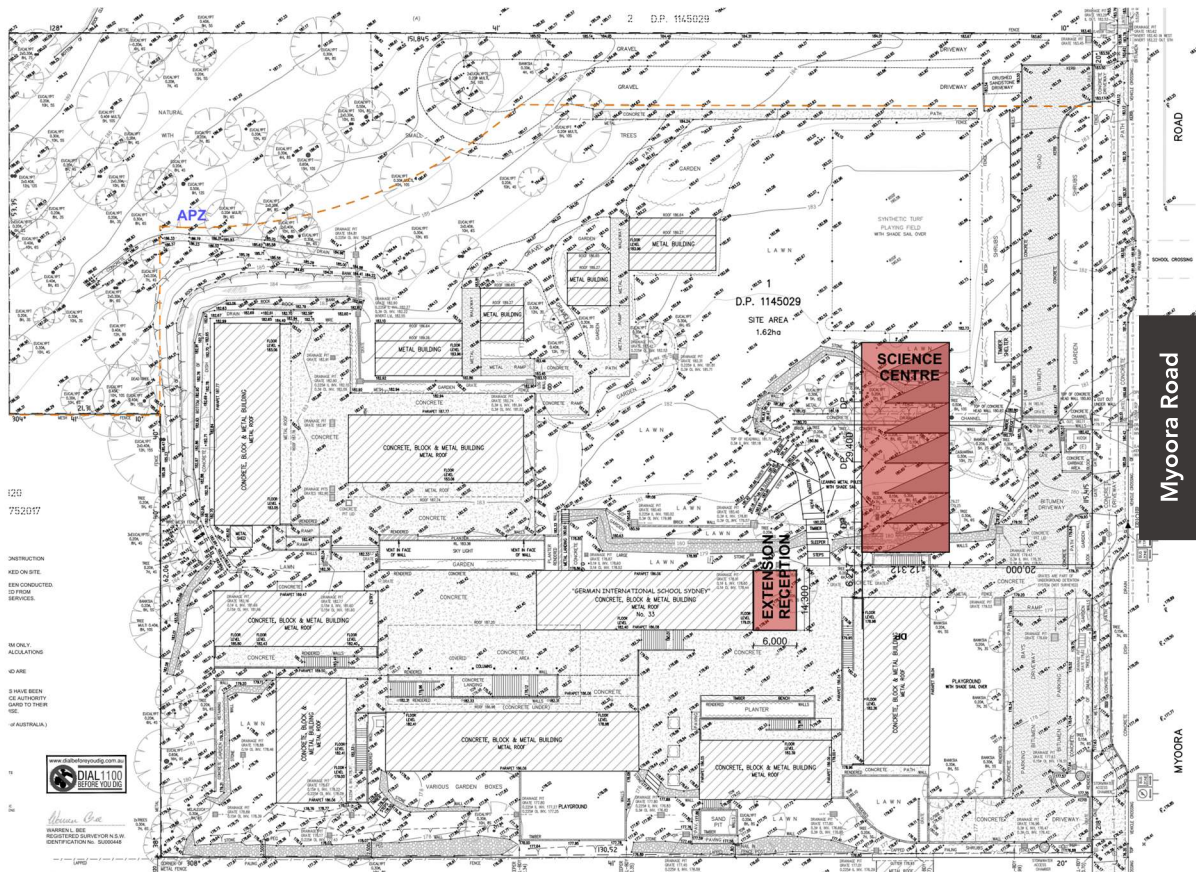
Proposed Site Plan (Source: Betti and Knut)
